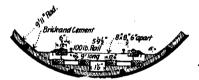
St. Clair Tunnel; Grand Trunk Ry.
